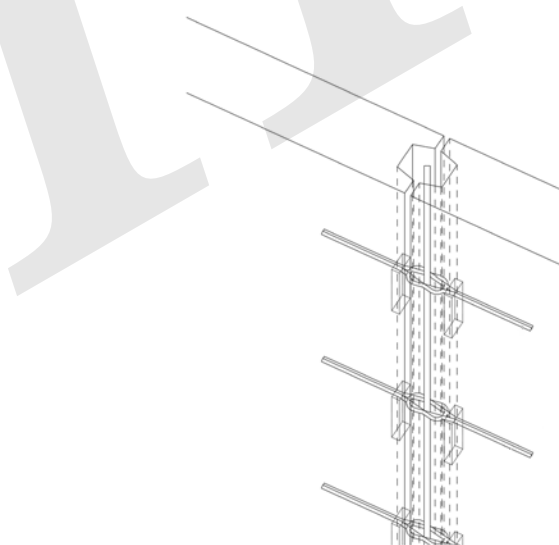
Profiled vertical wall joint incorporating wire rope boxes.
